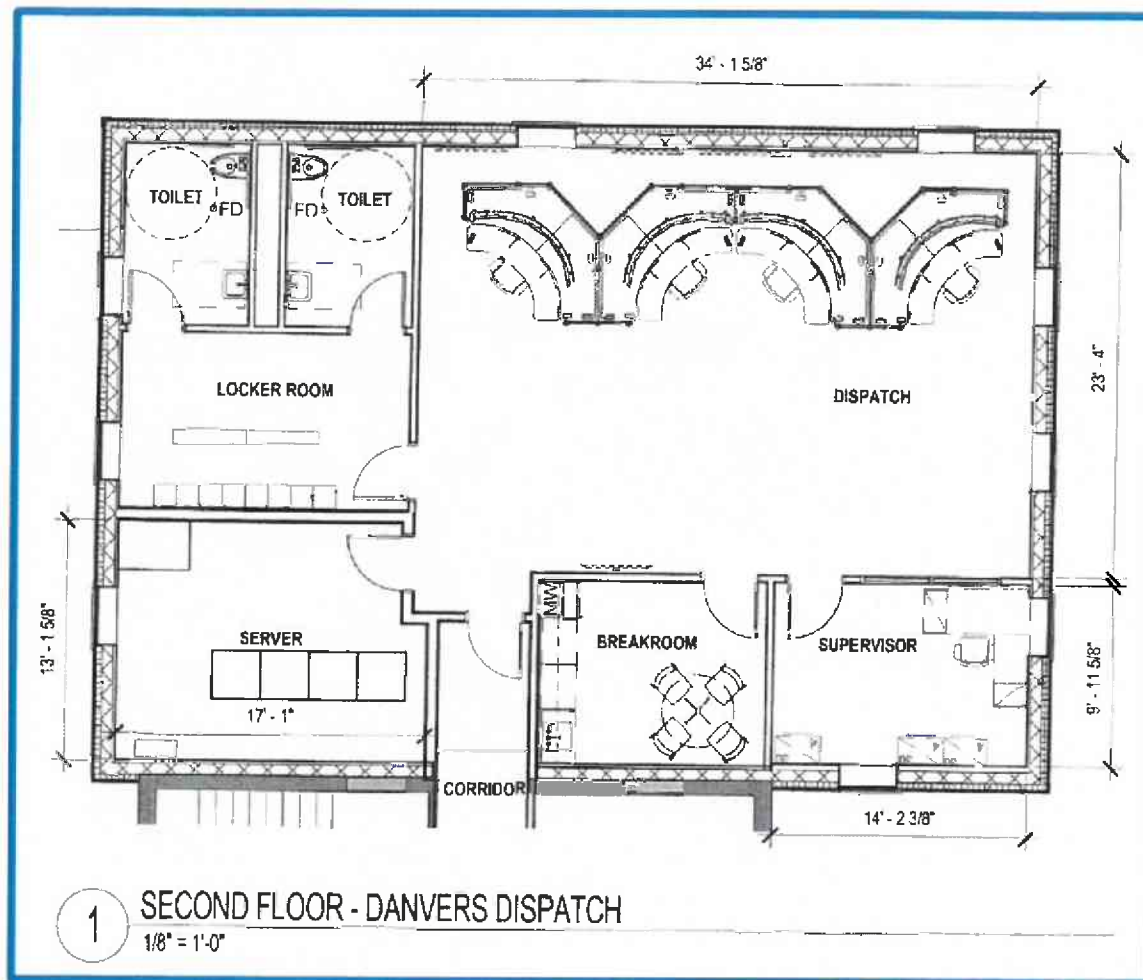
NEW DANVERS DISPATCH CENTER FLOOR PLAN
